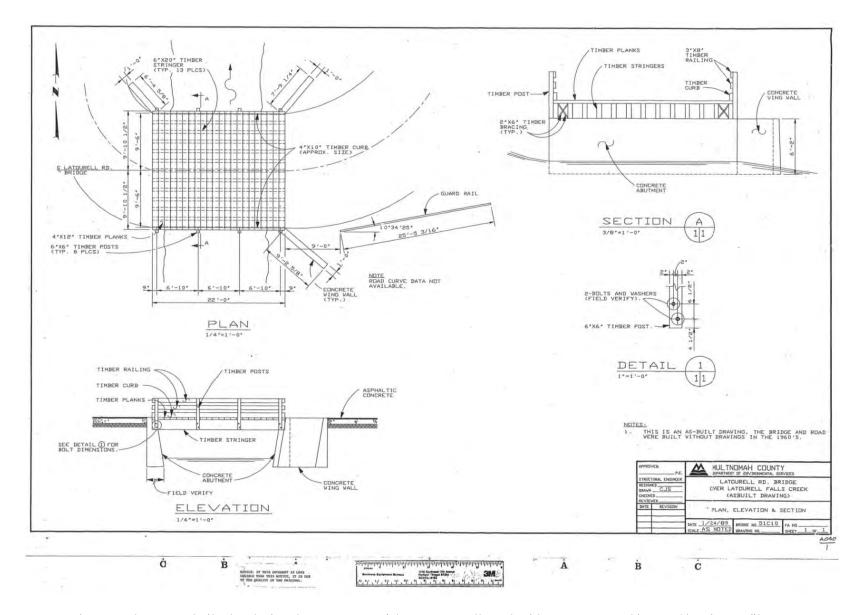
The 1989 as-built plan depicts the appearance of the NE Latourell Road Bridge as constructed in 1968 (drawing on file, Multnomah County, Oregon).
